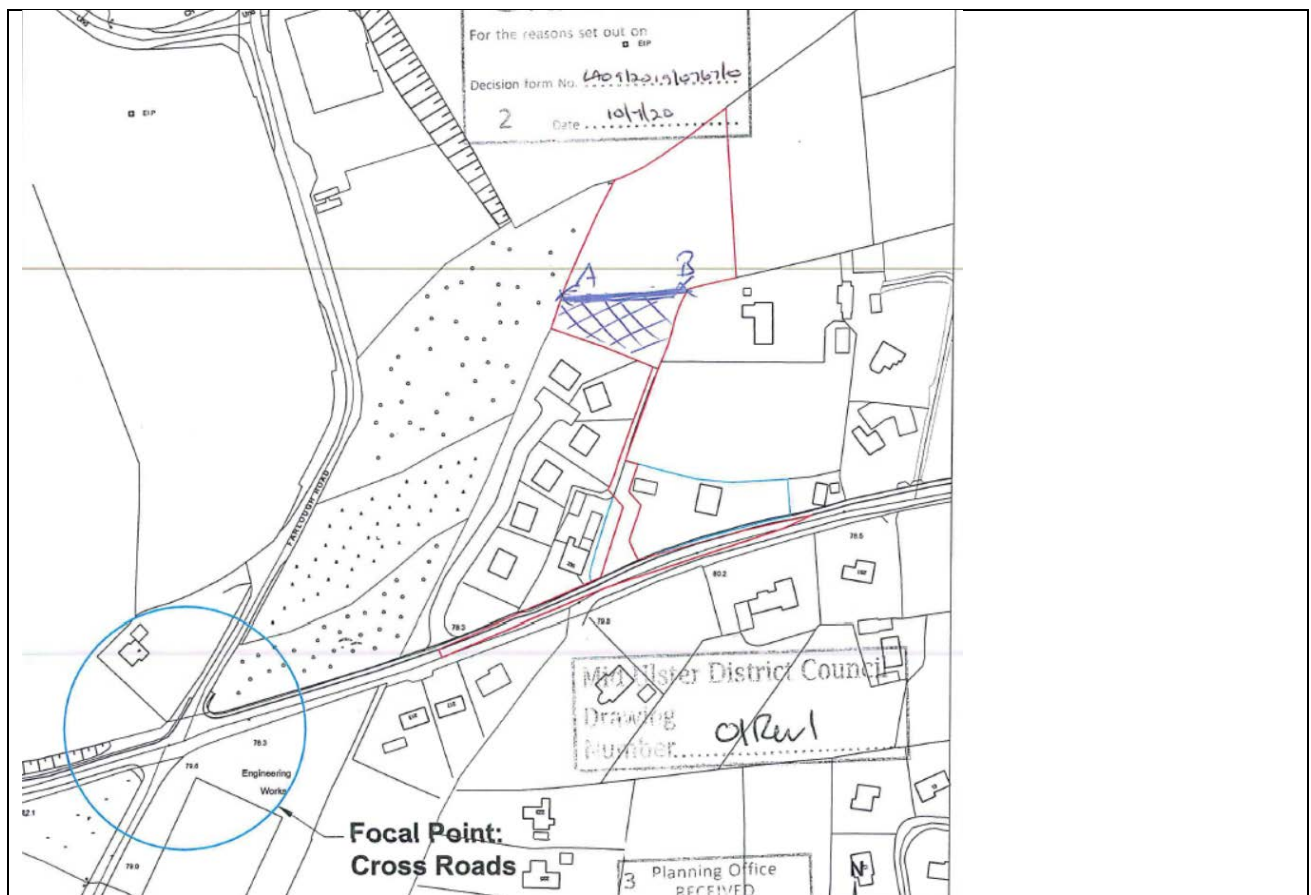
Screenshot of the stamped approved site location plan from LA09/2019/0767/O
